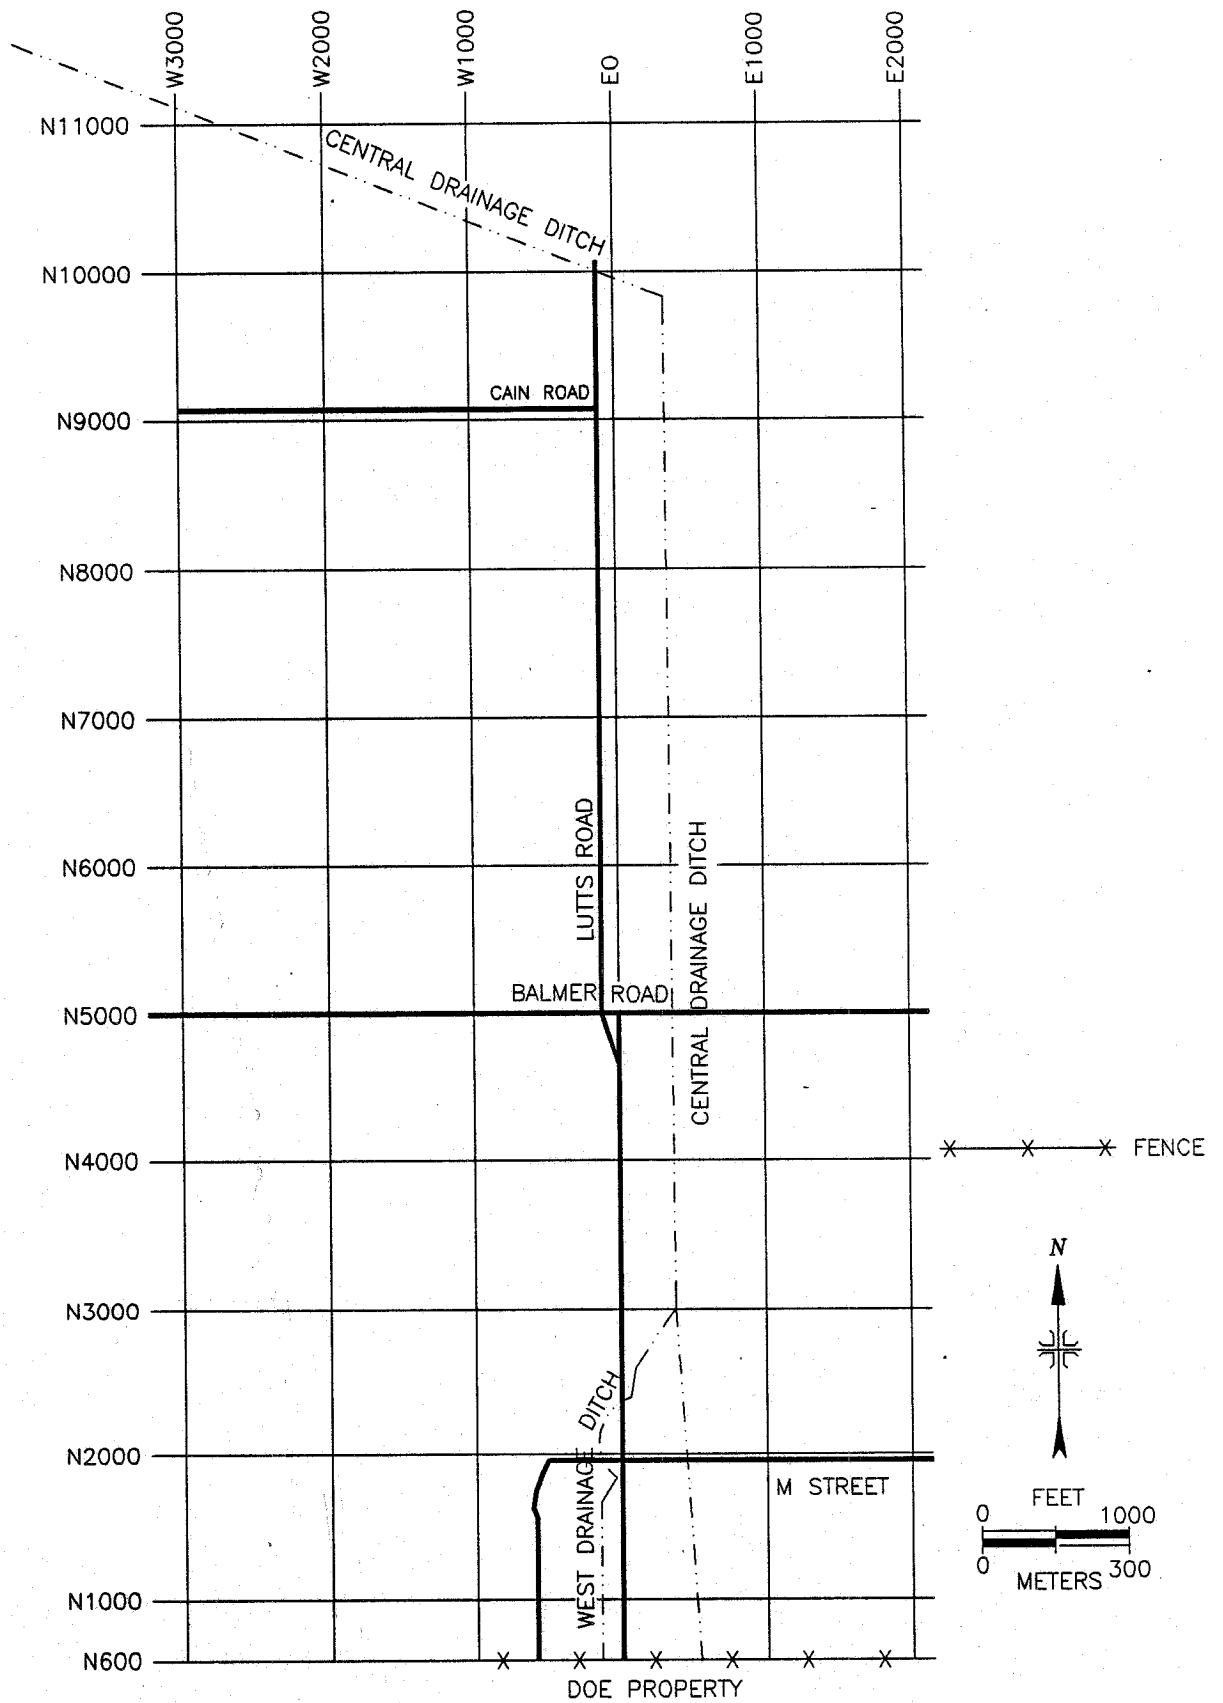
Plot Plan of the West and Central Drainage Ditches
